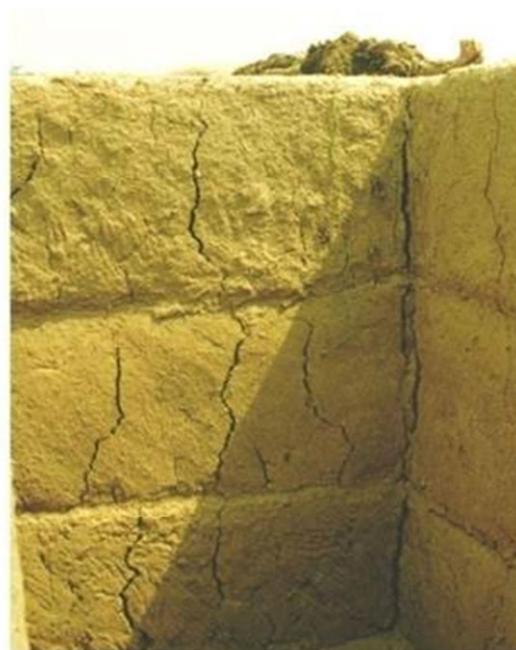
Building under construction by technique of Zabur in Rahban - Saada was built in the summer and shrinkage cracks appear enormously.
